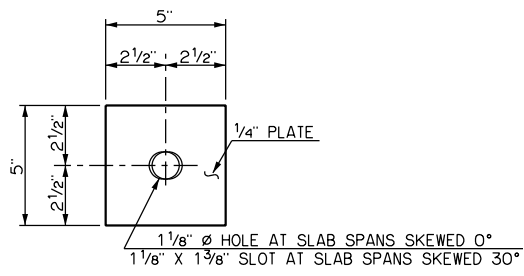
DETAILS OF BRIDGE TRAFFIC RAIL POST ASSEMBLY
